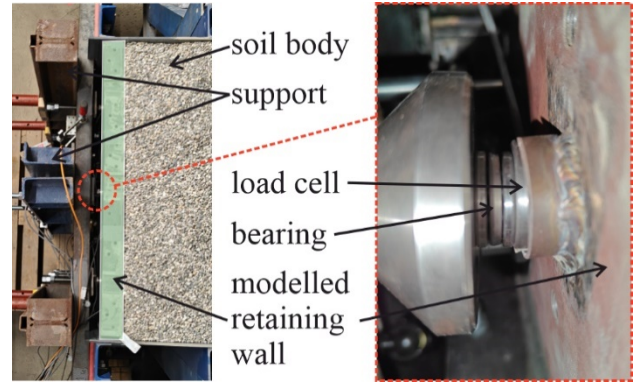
Load cell installation at the transition zone between the wall element and the bracing unit.
